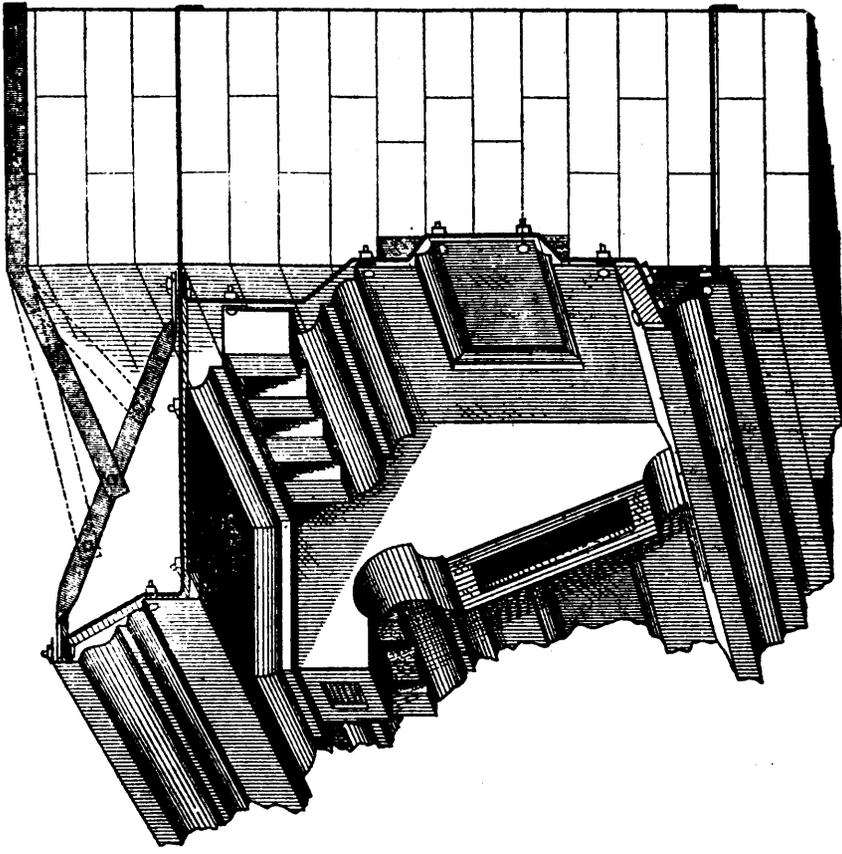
CONSTRUCTION WITH IRON LOOKOUTS.
